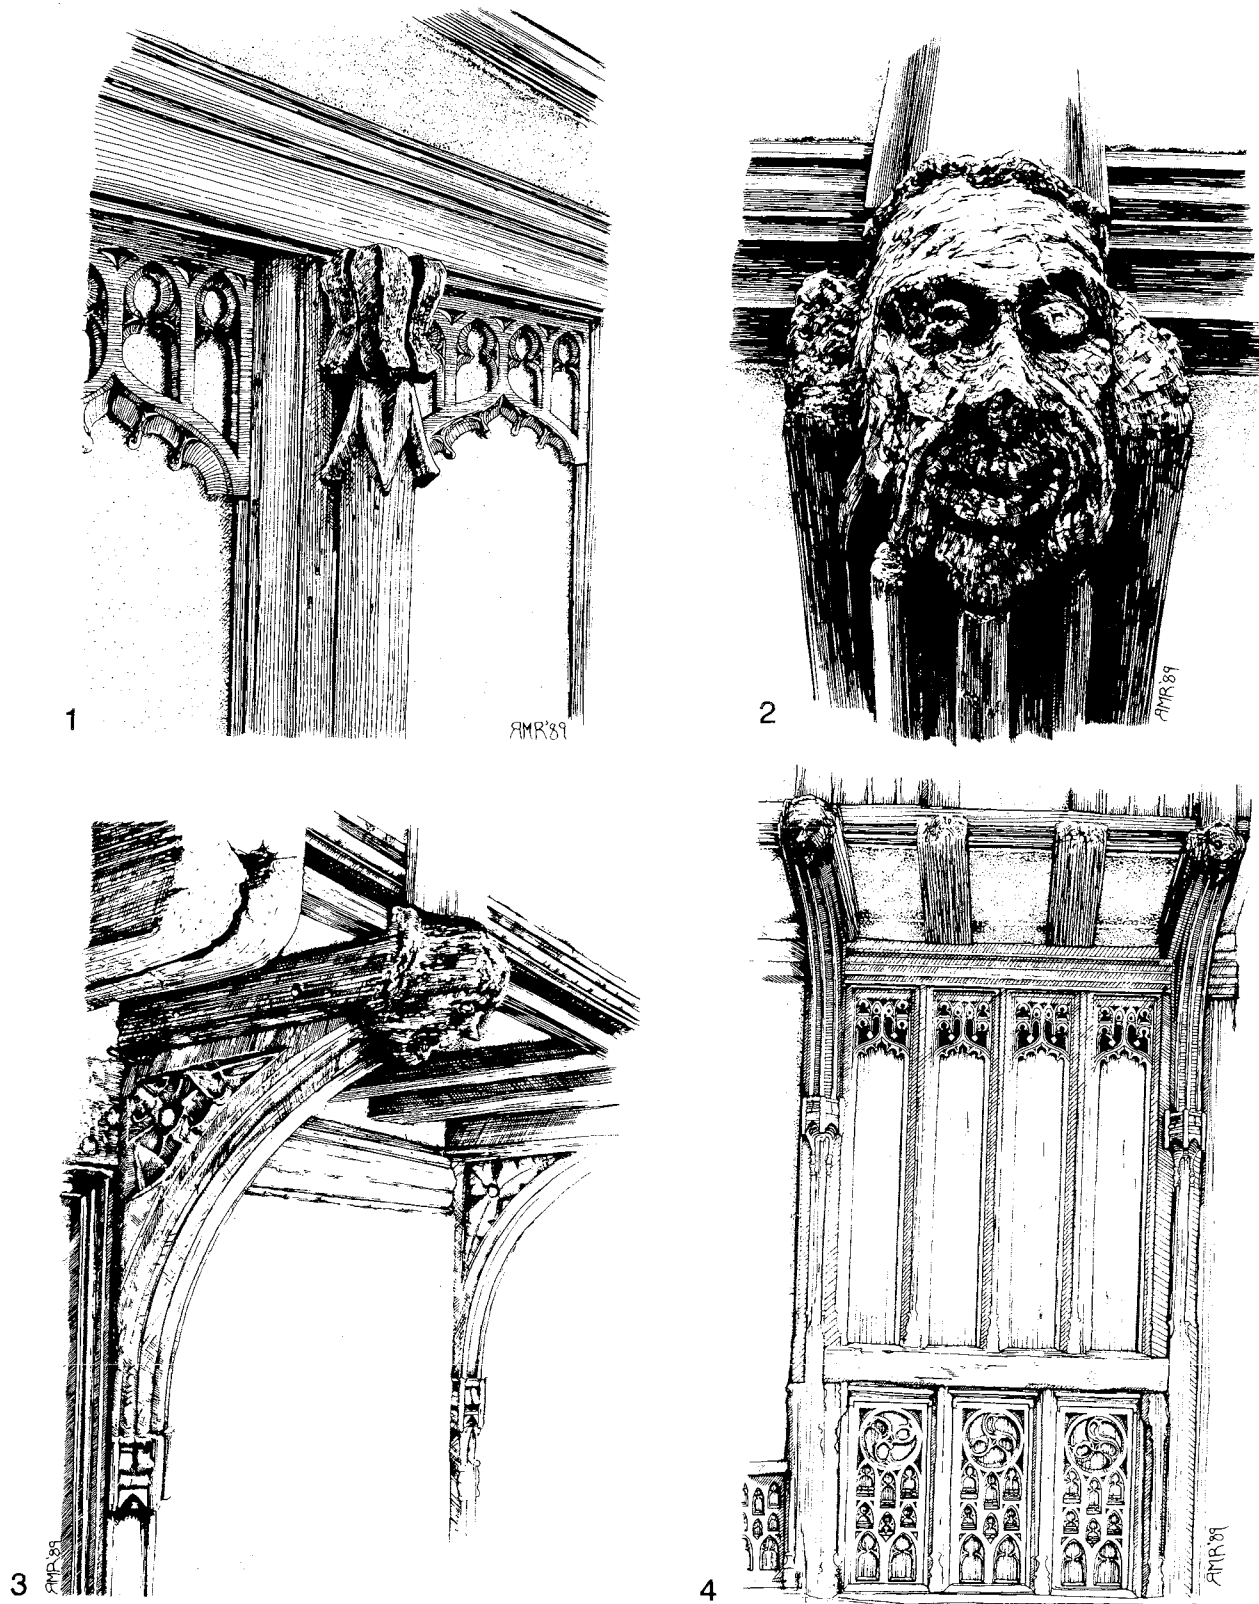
The Red Lion, Colchester. Details of High Street elevation:
